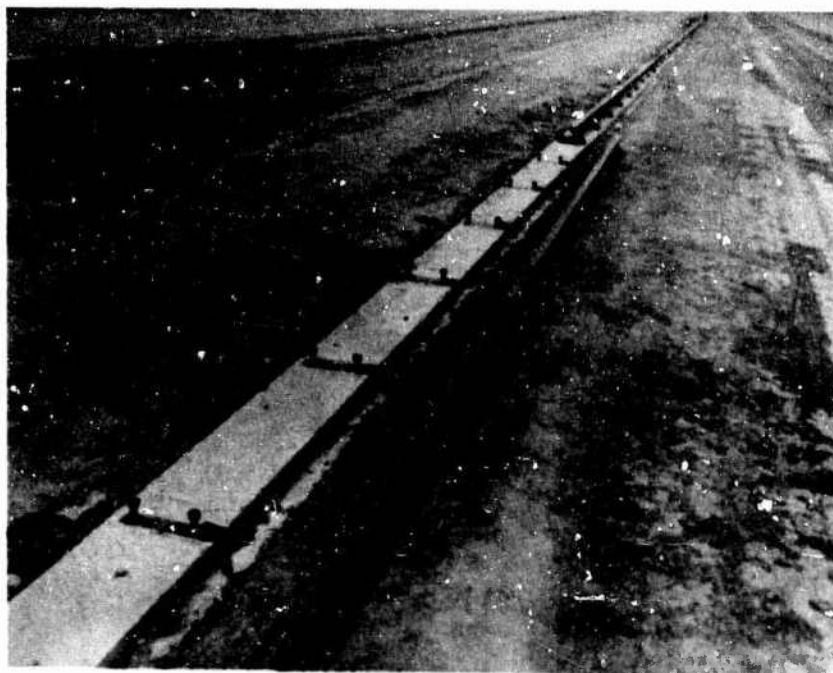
CONCRETE BASE FOR GUIDE RAIL
